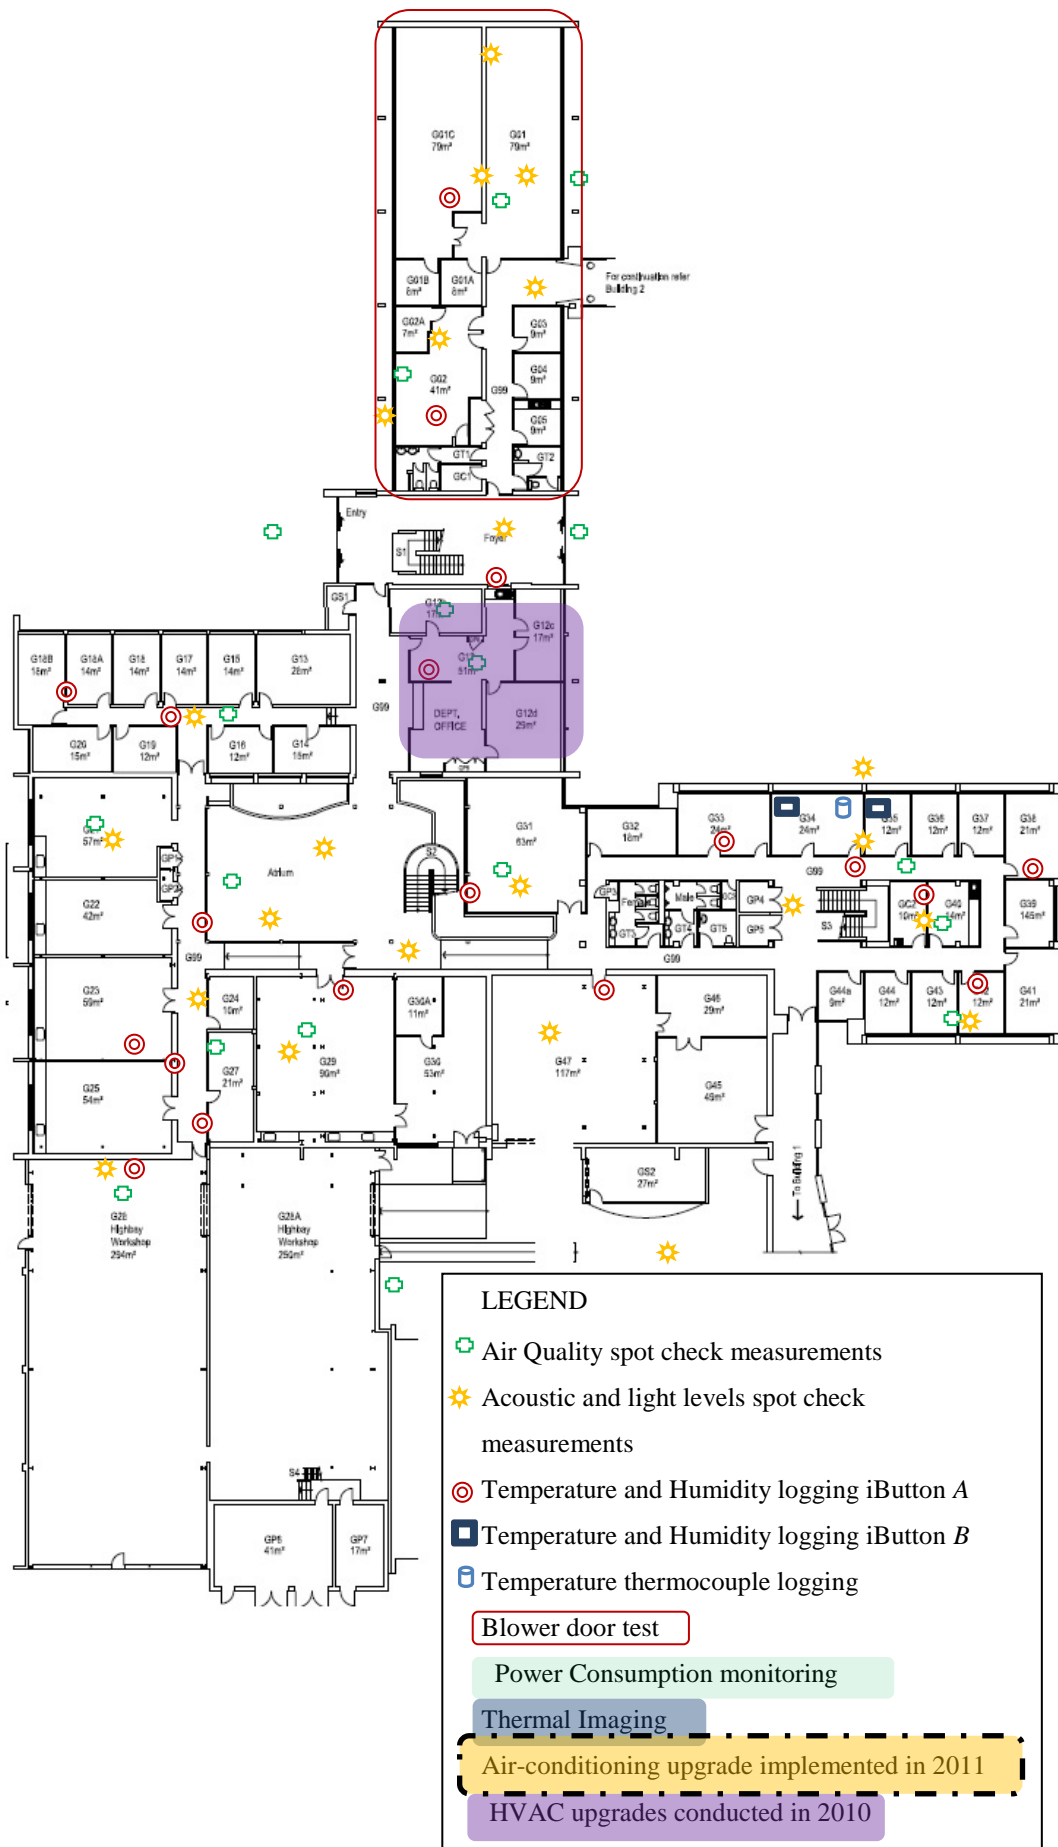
Monitoring plan for ground floor and first floor of Building 4, with location types of logging, spot checks measurements and tests conducted.
